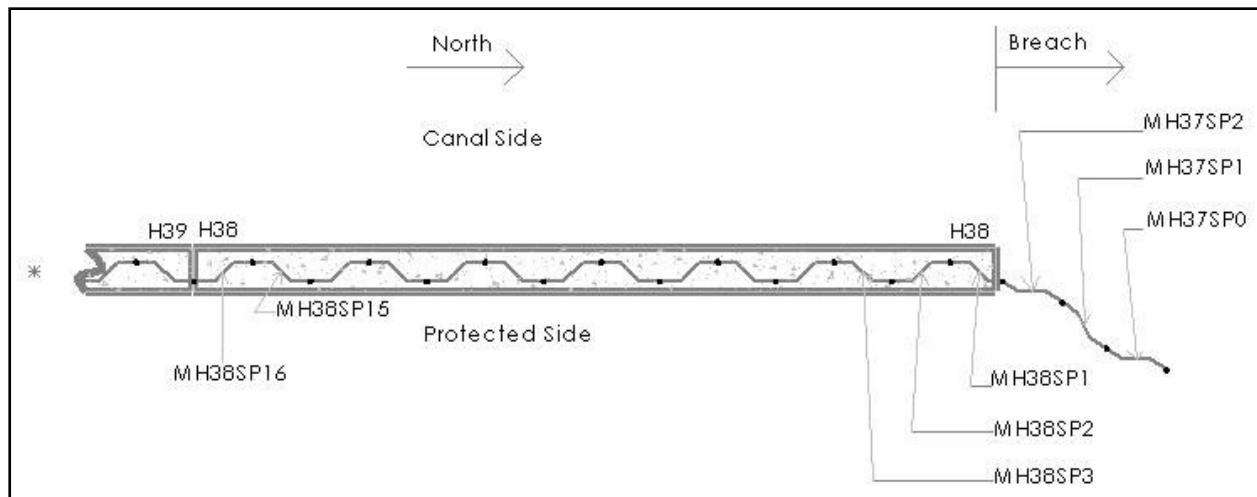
Sheet Pile Designations at Wall Panel H38
